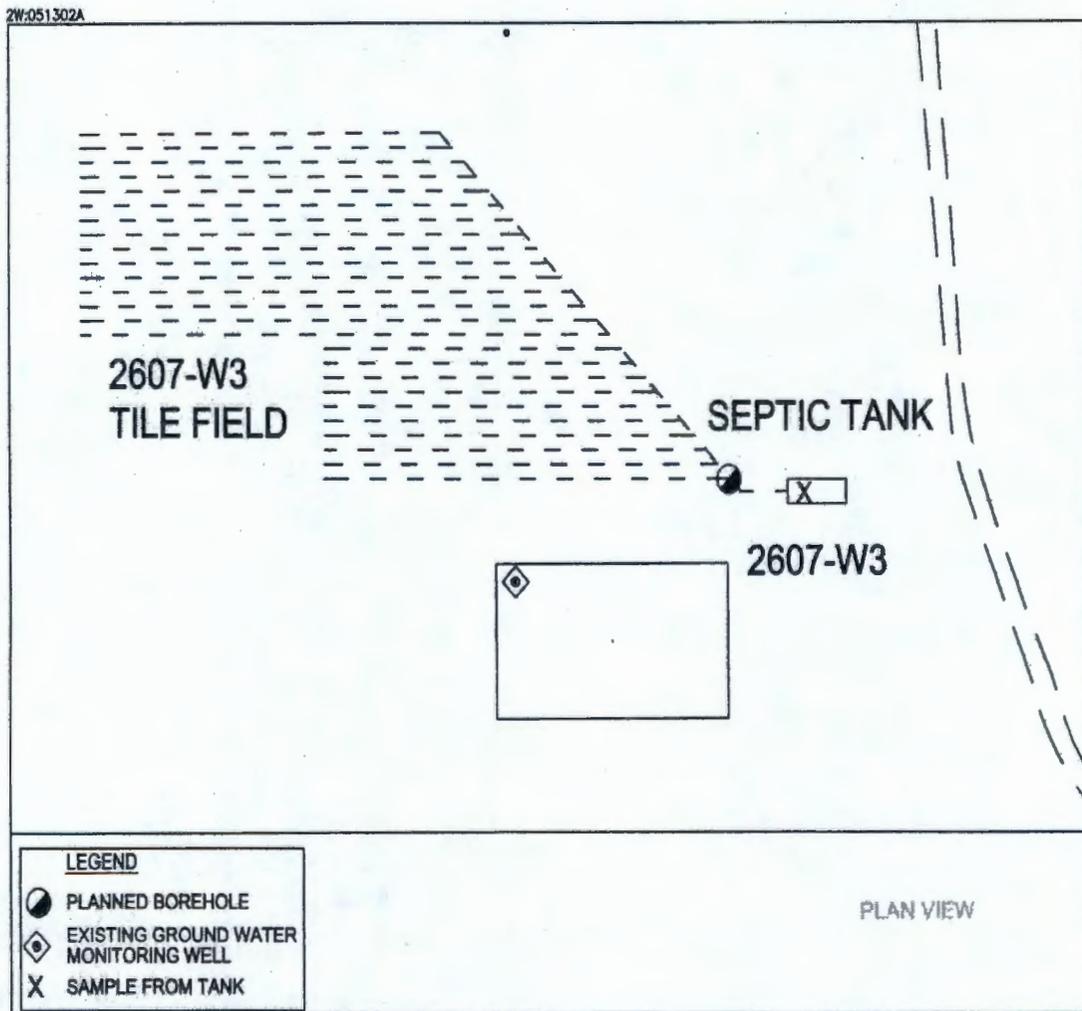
Location of Planned and Existing Boreholes at the Hexone Storage and Treatment Facility.
